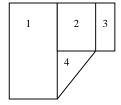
Dividing a Ceiling into Ceiling Elements
